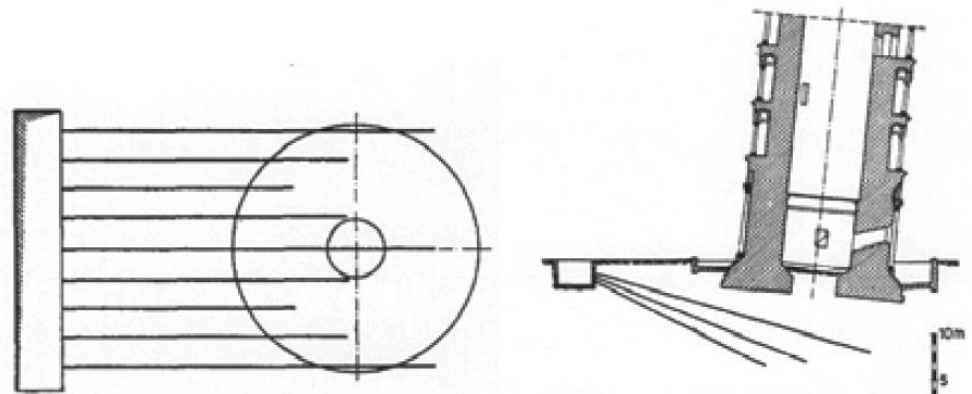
Layout of the underexcavation proposed by Terracina (1962).
